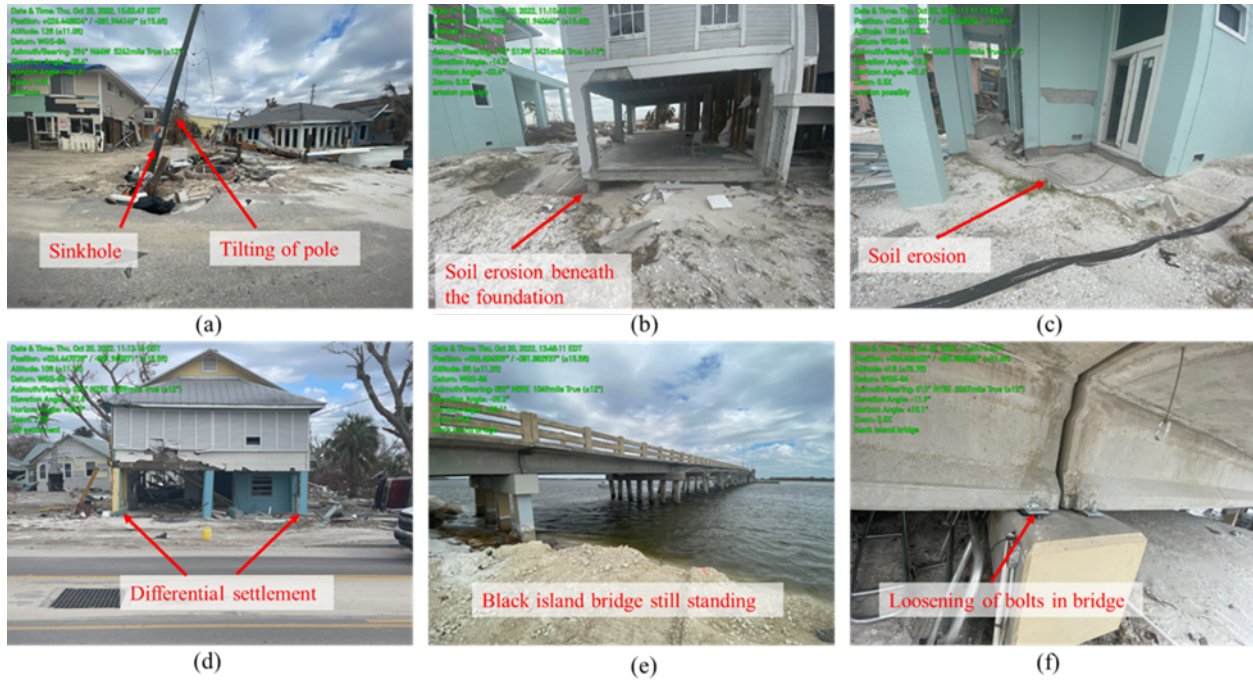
Surveying in Fort Myers Beach: (a) Formation of sinkholes and tilting of pole (b) Soil erosion beneath and around the foundation; (c) Soil erosion; (d) Differential settlement causing damage to the building; (e) Black Island bridge intact after the hurricane; (f) Loosening of bolts in the bridge. Coordinates: 26.45121, -81.95105
